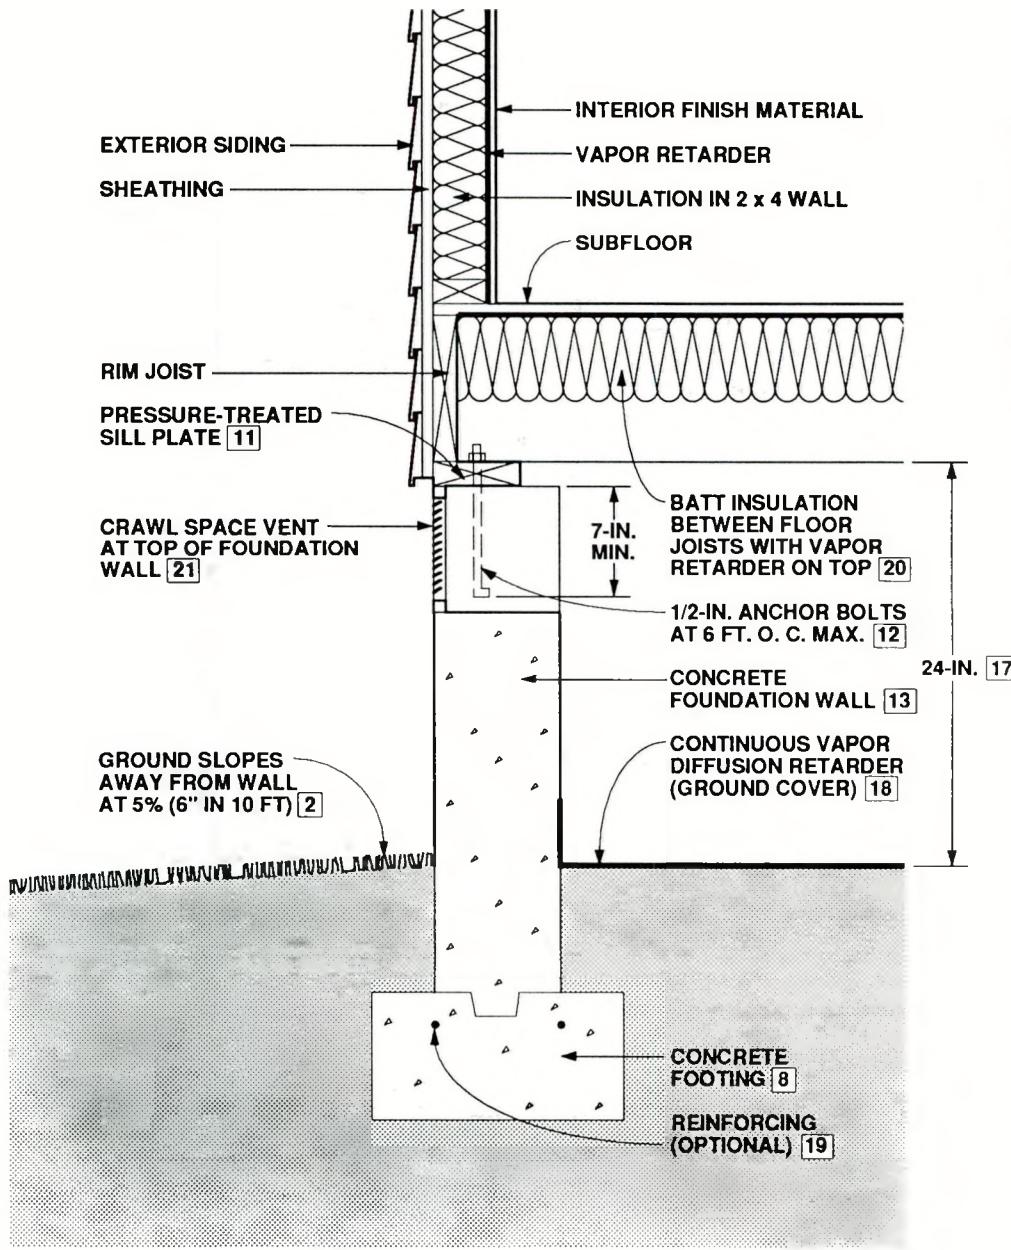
Vented Crawl Space Wall with Ceiling Insulation
